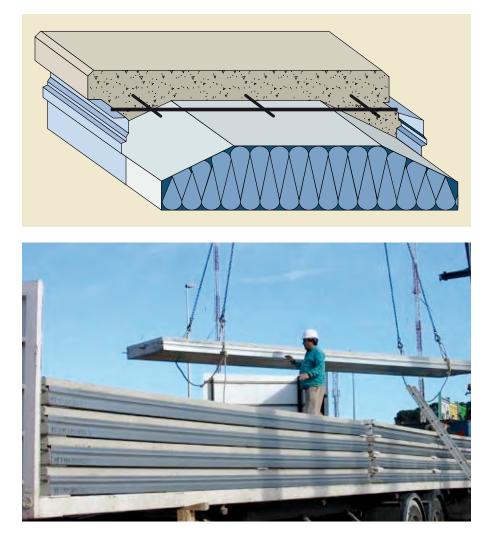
Cofradal lightweight slab units – typical cross section and panels during installation
